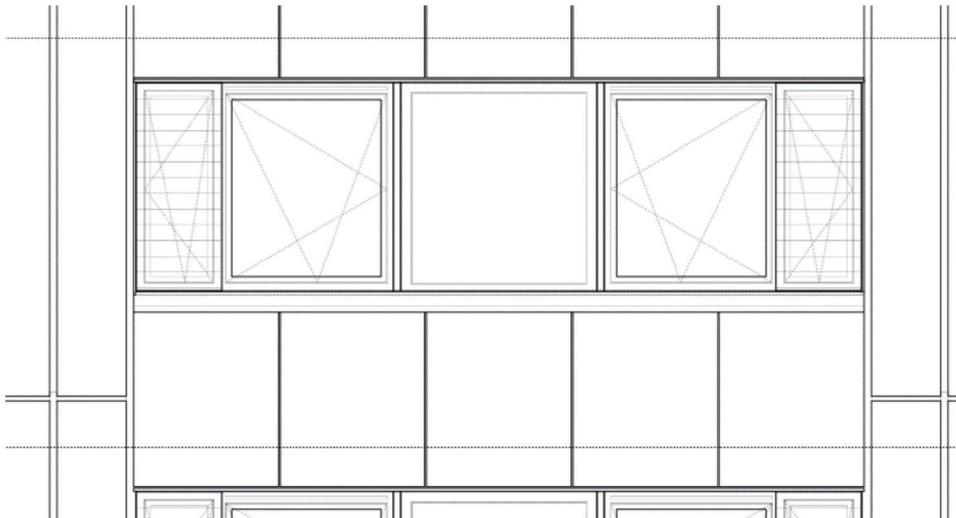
Extract from Studio E Employer's Requirements drawing 1279 (06) 110 00 'Proposed Typical Bay Plans, Section & Elevation' {SEA00002499}
